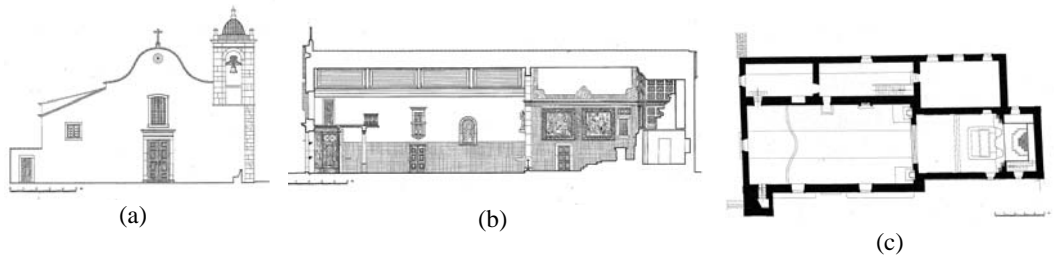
Geometry: (a) main façade; (b) longitudinal cross-section; (c) plan.
